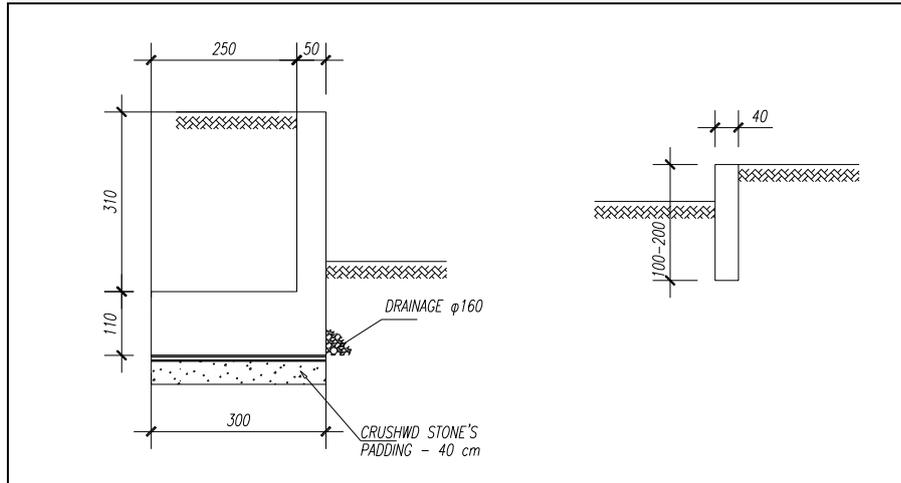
Cross – section through reinforced concrete retaining wall type and thin retaining wall type.
